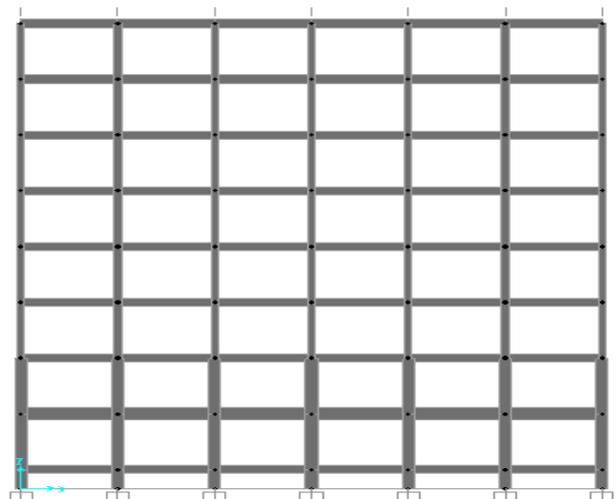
Elevation of building with increase in dimension at two consecutive floors
